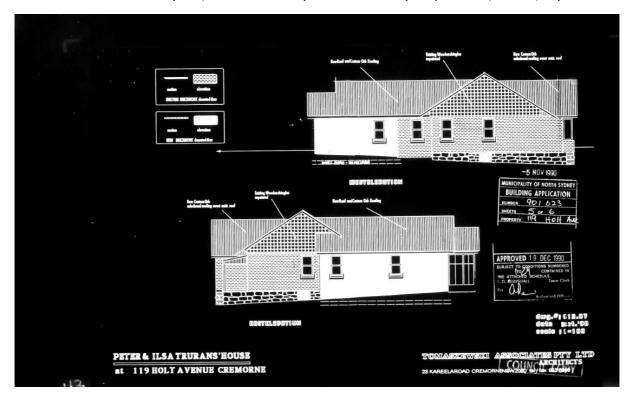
East and west elevations, north and south elevations, Peter and Ilsa Truran's house, 119 Holt Avenue / Tomazsweki Associates Pty Ltd, October 1990. (Source: North Sydney Council, BA623/90)
